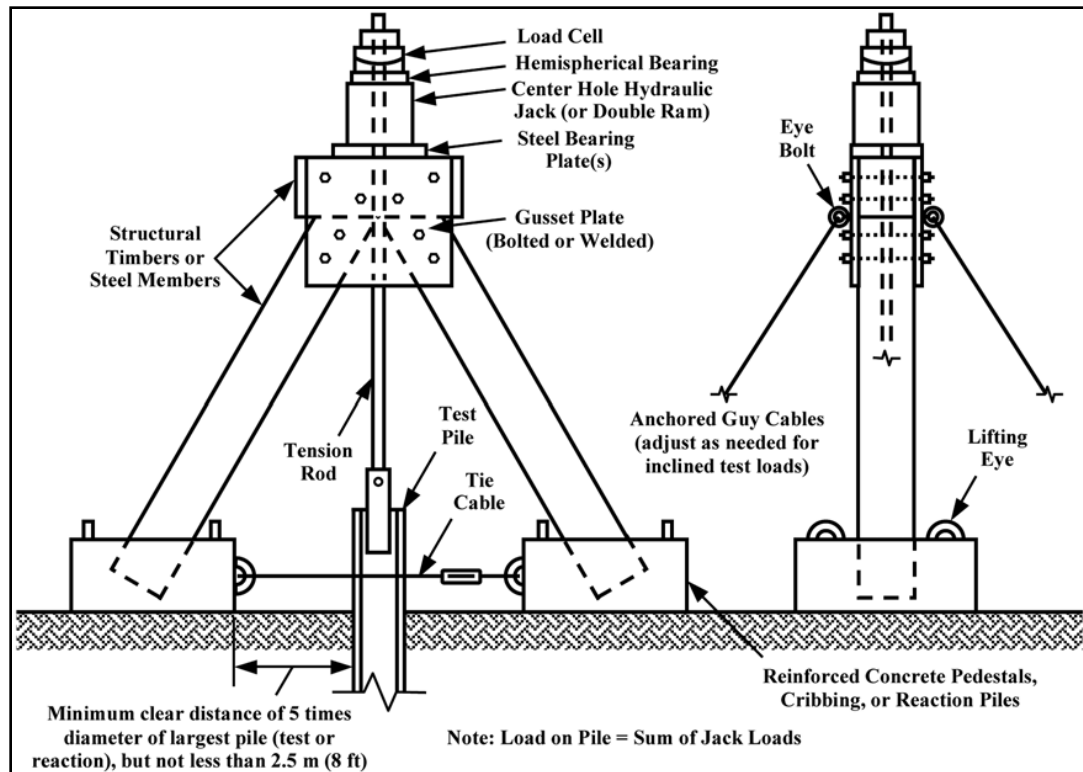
Typical setup for tensile load test using hydraulic jack(s) acting at top of an A-frame (ASTM D3689 – 07).
